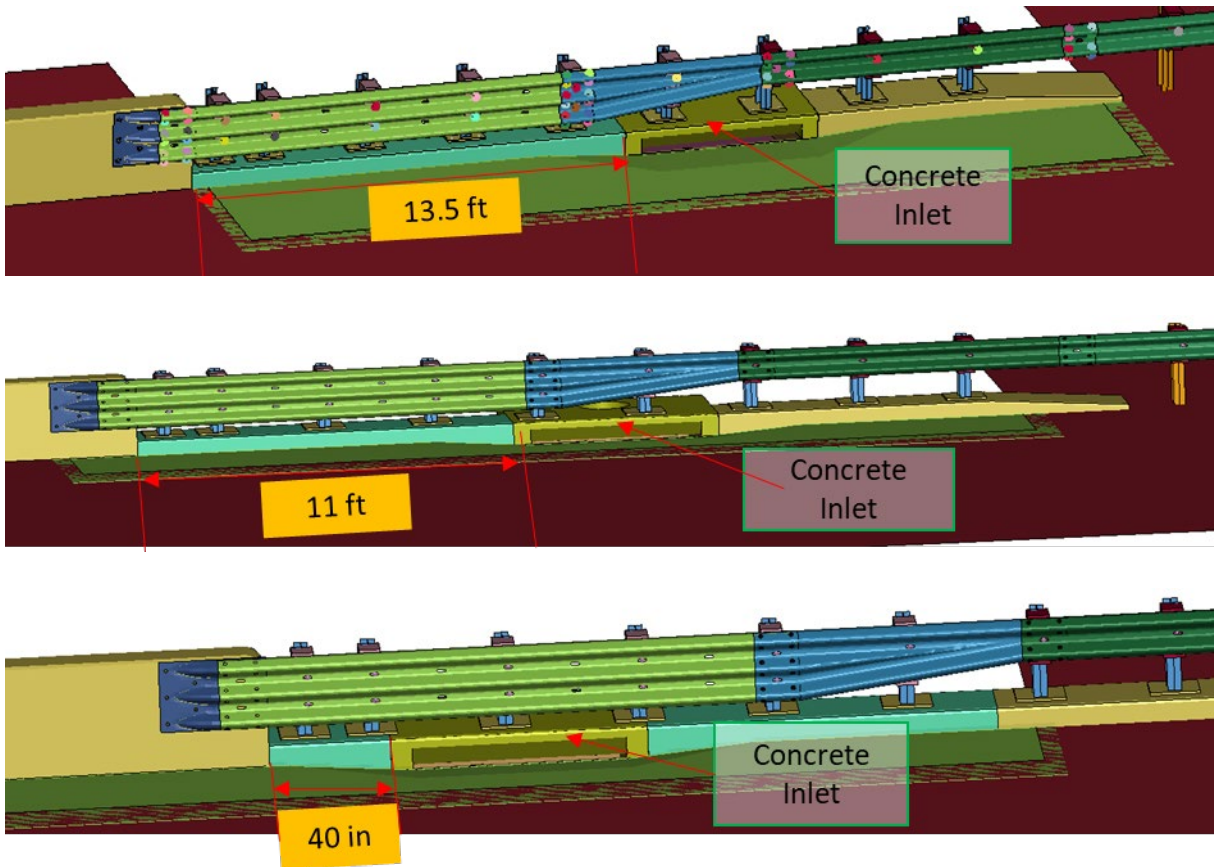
Transition Model with Monolithic Inlet with 13.5 ft, 11 ft, and 40 inches (3.3 ft) Offset Distance from Concrete Parapet.
